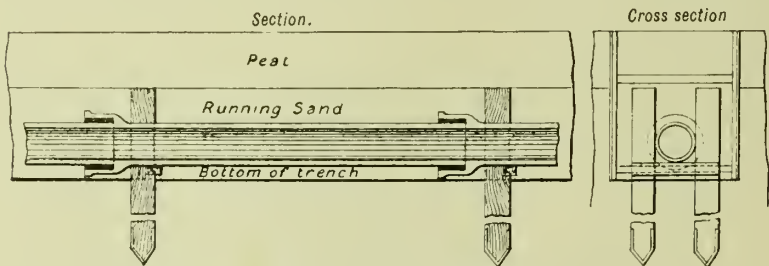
Foundation for Iron Pipe Drain in bad ground.
